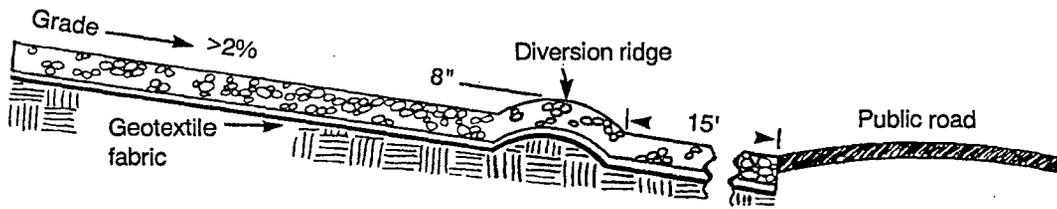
Cross-section of a Construction Entrance/Exit (NC, 1993)
